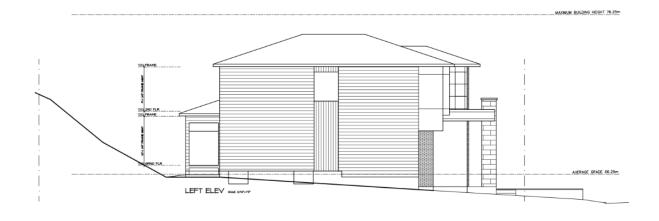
Left Elevation, prepared by David Bekkers M.A.A.T.O
